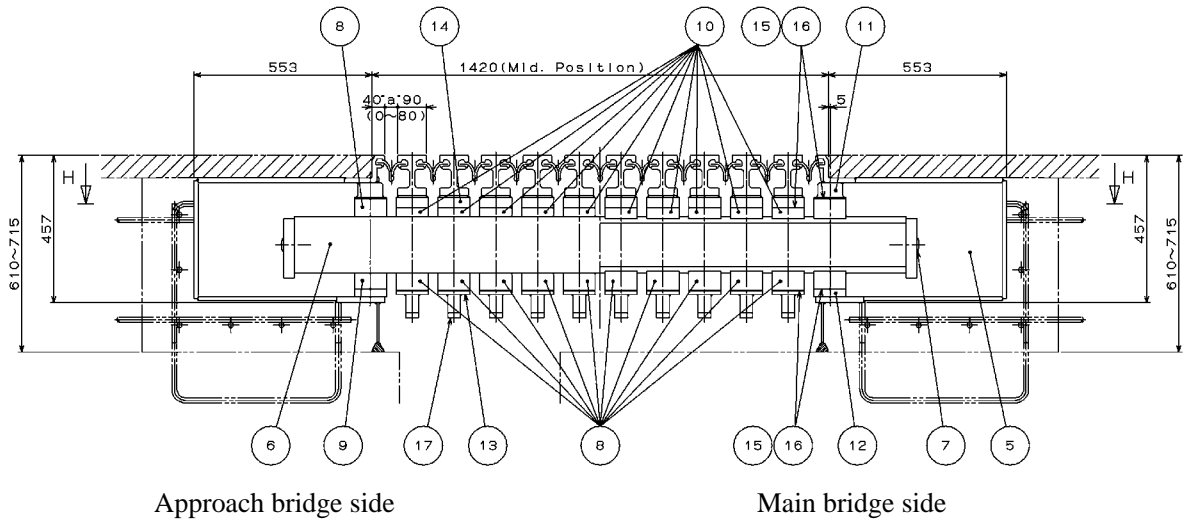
Expansion Joint between Approach Bridge and Main Bridge
